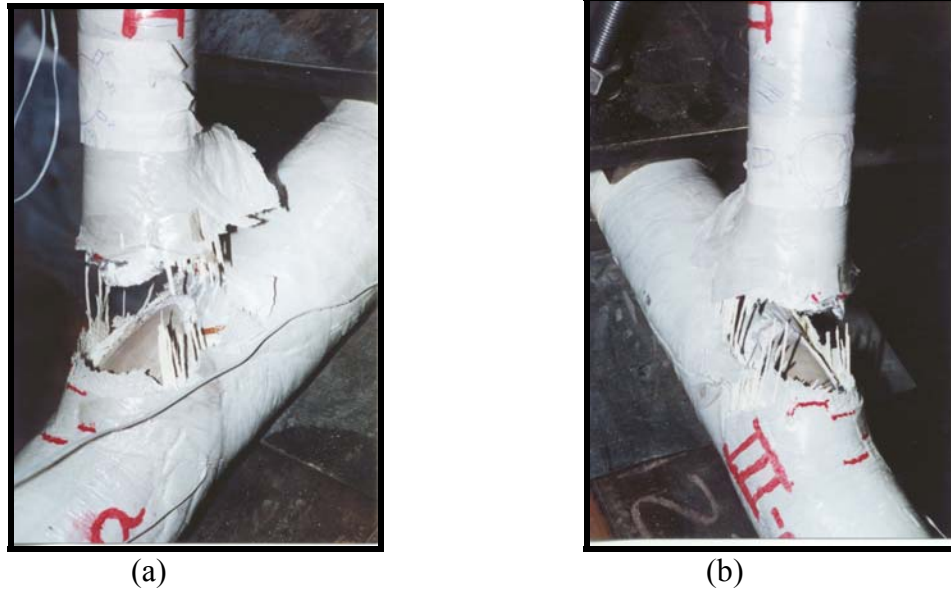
Test III-a: (a), and (b) Failure of weld and FRP composite
